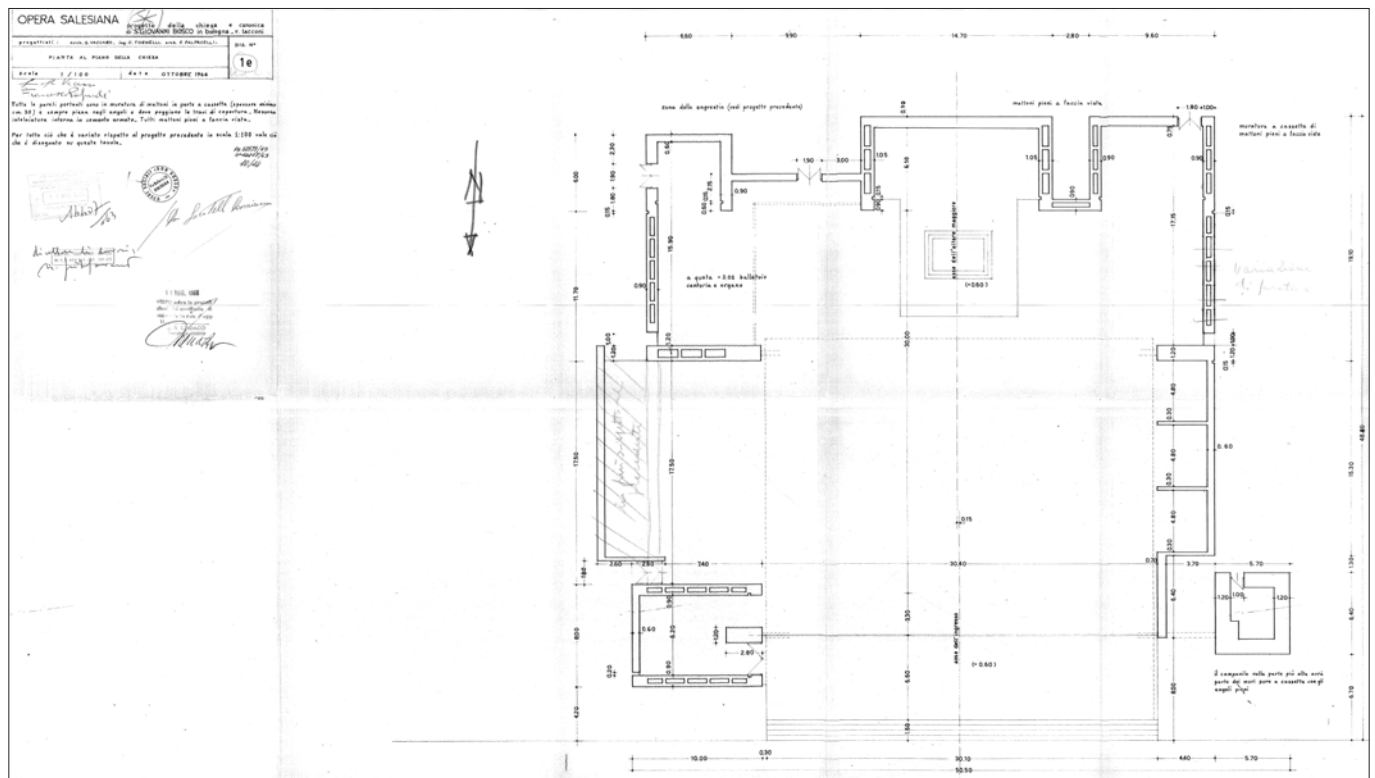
Ground floor layout included in the architectural drawings, 1963 [9].
